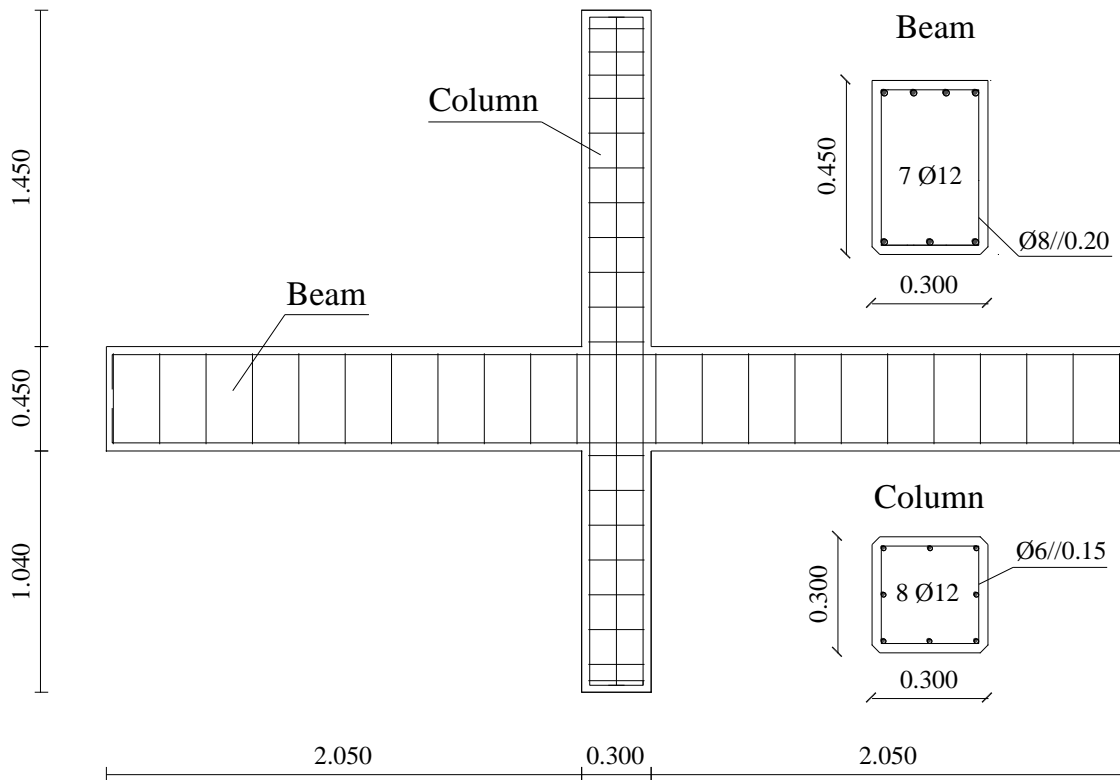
Reinforcement detailing for specimen C-noSLT without slab and transverse beam (in m).
